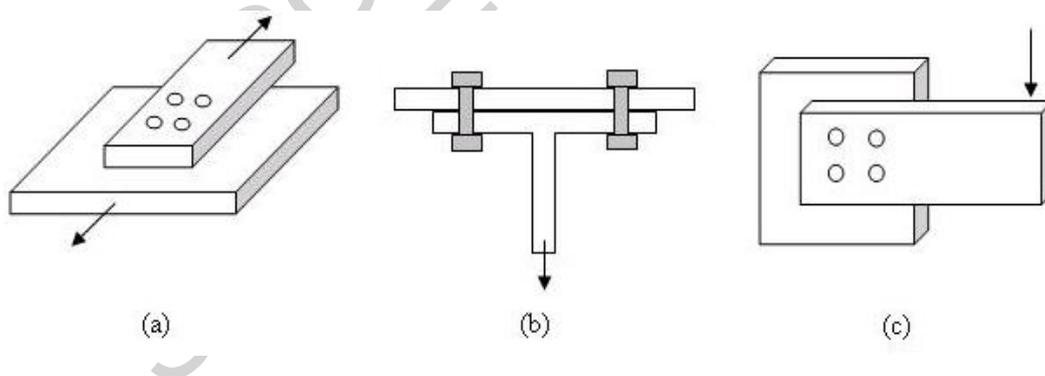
Types of bolted connections (a) Lapped tension splice (b) Hanger type connection (c) bracket type connection
